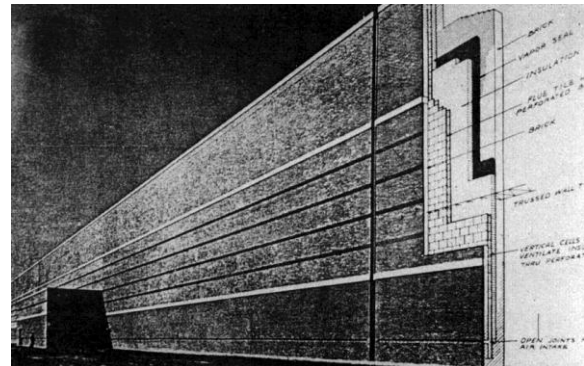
Breathing Wall. Tinker AFB, Oklahoma
